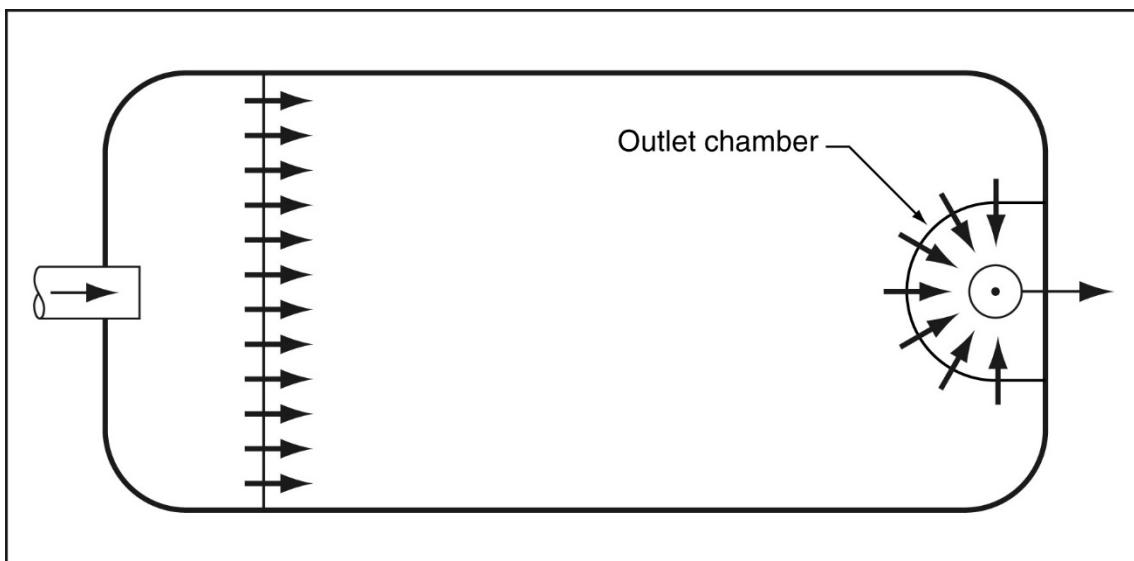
Typical arrangement of an inlet and outlet chamber (plan view)
